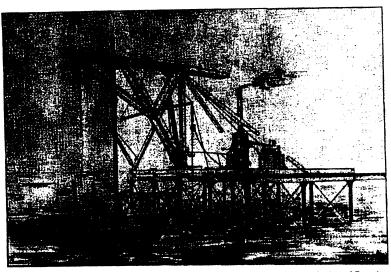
A Steam-Powered Pile Driver Placing Foundation Piles for Pea Patch Island, circa 1838 (Snyder & Guss, 1974).
